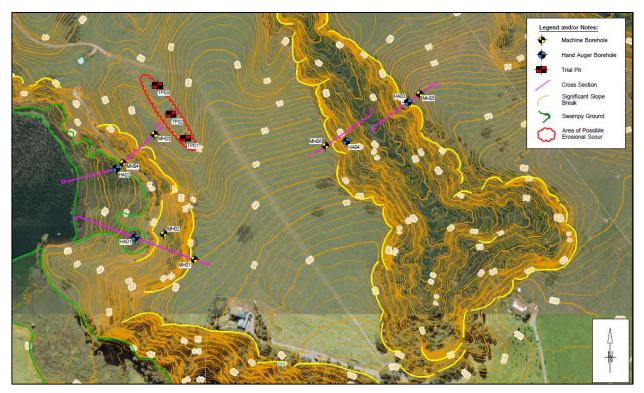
Site investigation plan (Source: Landers Geotechnical GIR
